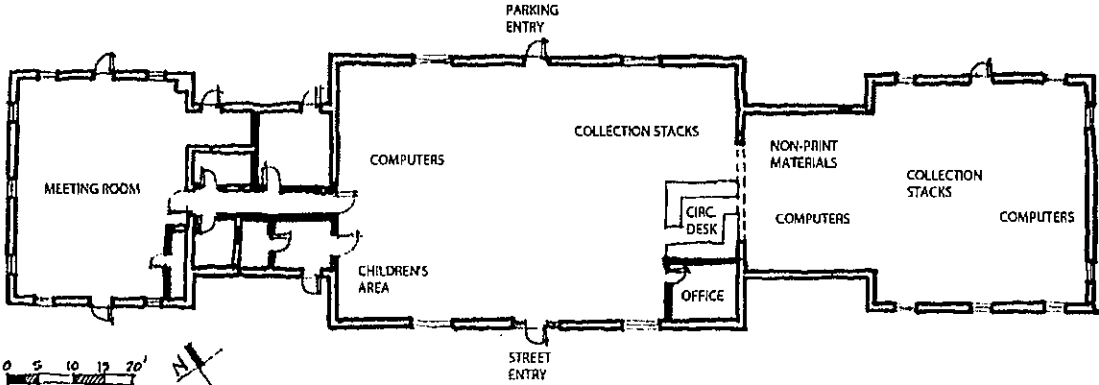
POCOMOKE LIBRARY FLOOR PLAN
